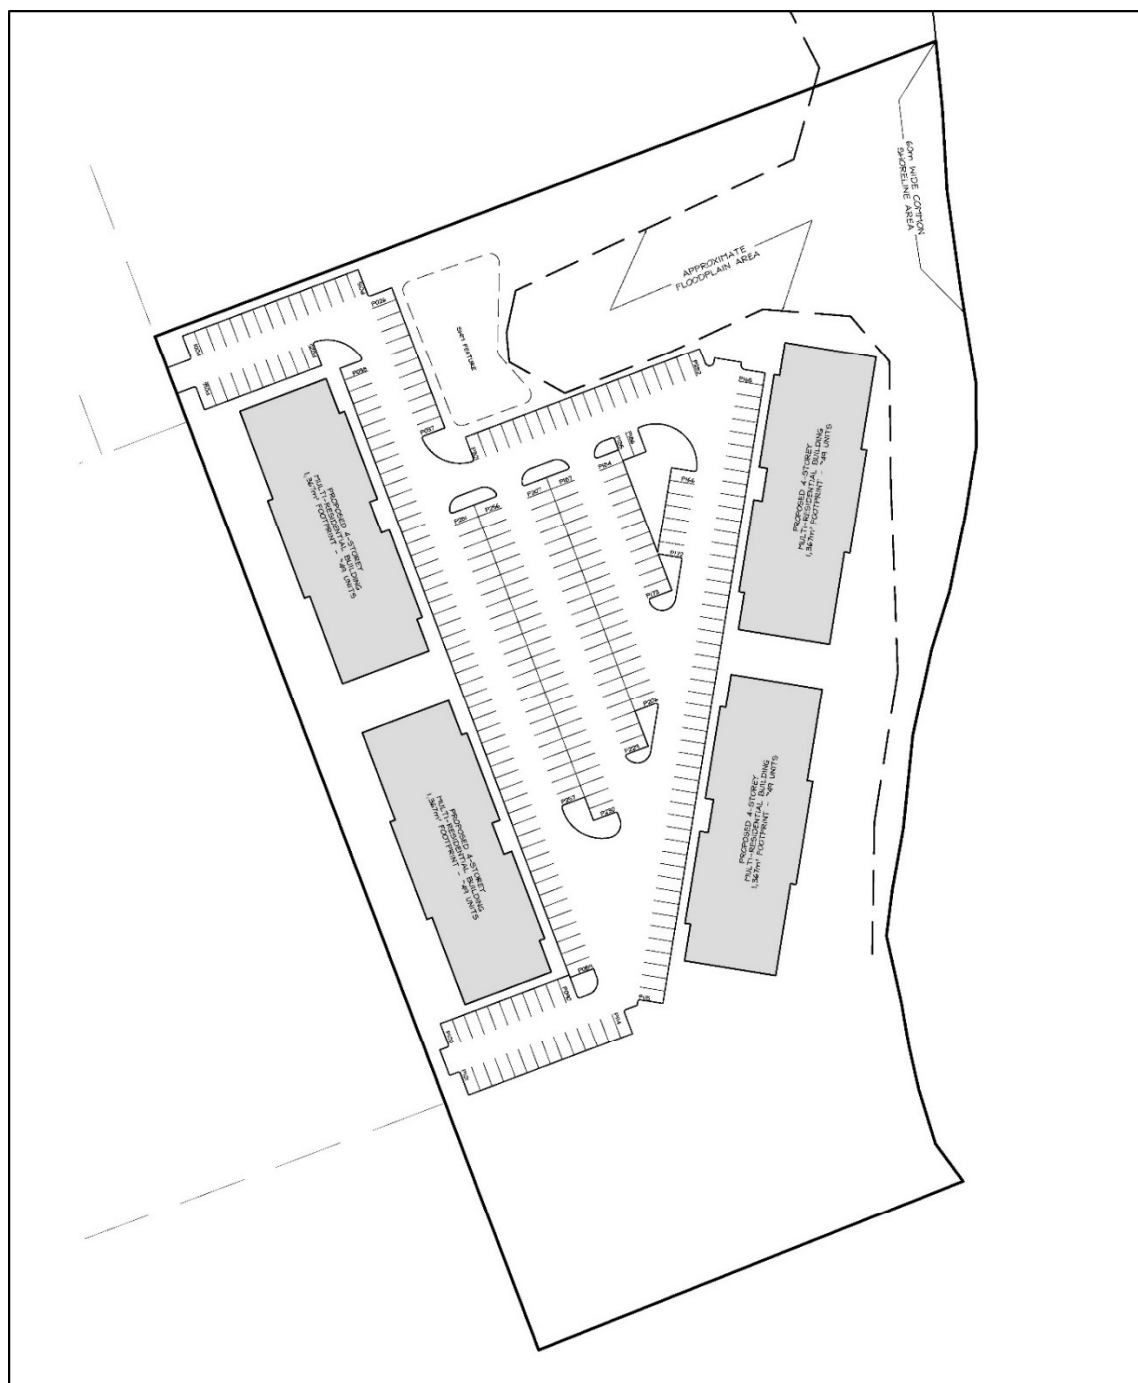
Conceptual Site Plan Illustrating Proposed Buildings (Plan Muskoka)
